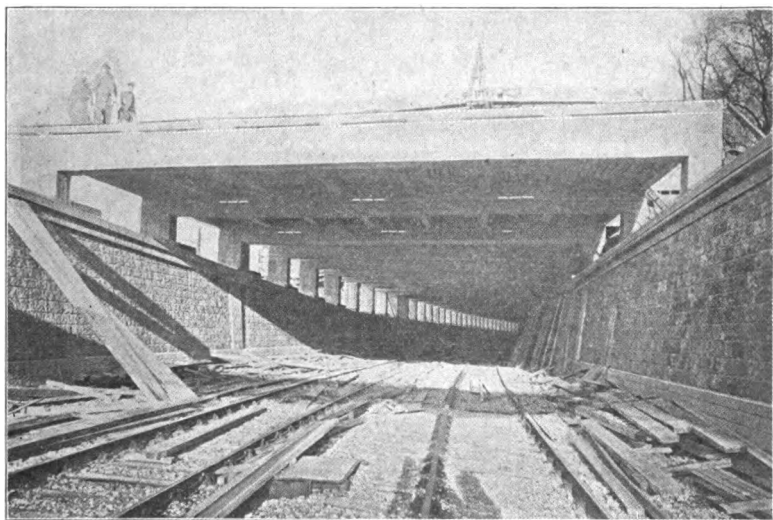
Covering of a Subway of the Metropolitan Electric Railway, Paris, France. Girders, 52 ft. span; live load, 200 pounds per square foot.
